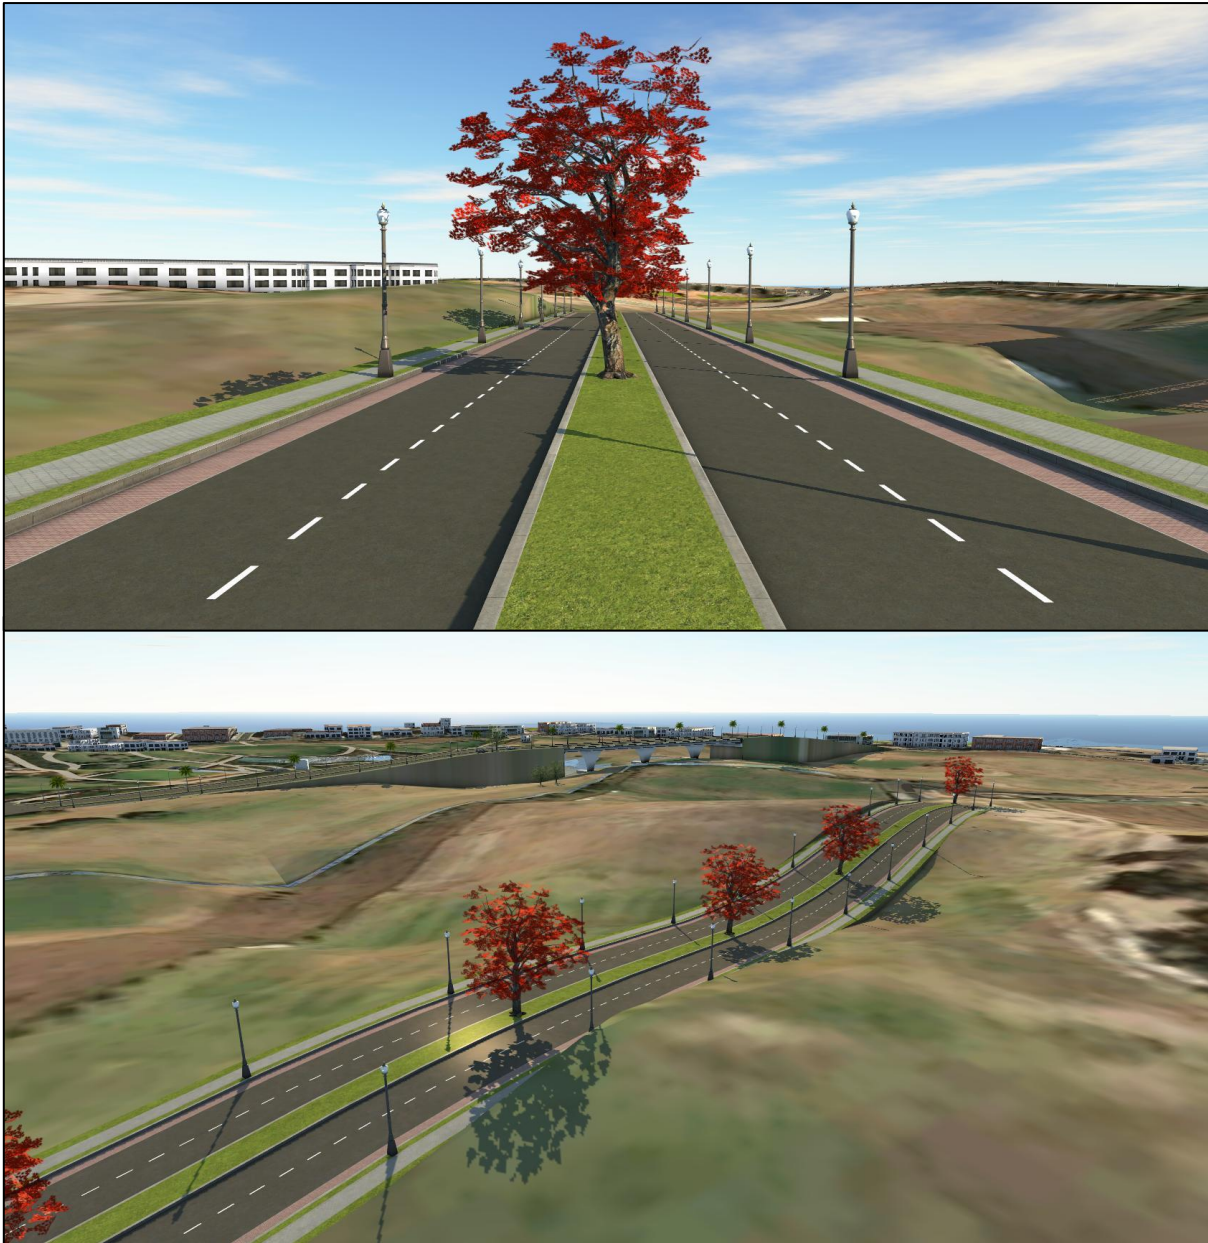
A Road Style Assigned to a Road Horizontal Alignment
